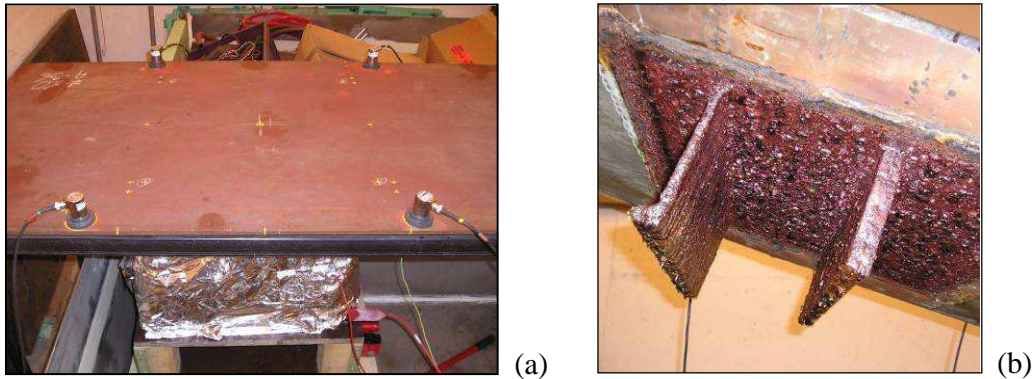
(a) Generation of corrosion and detection with AT; (b) corroded bottom side of steel test plate.
